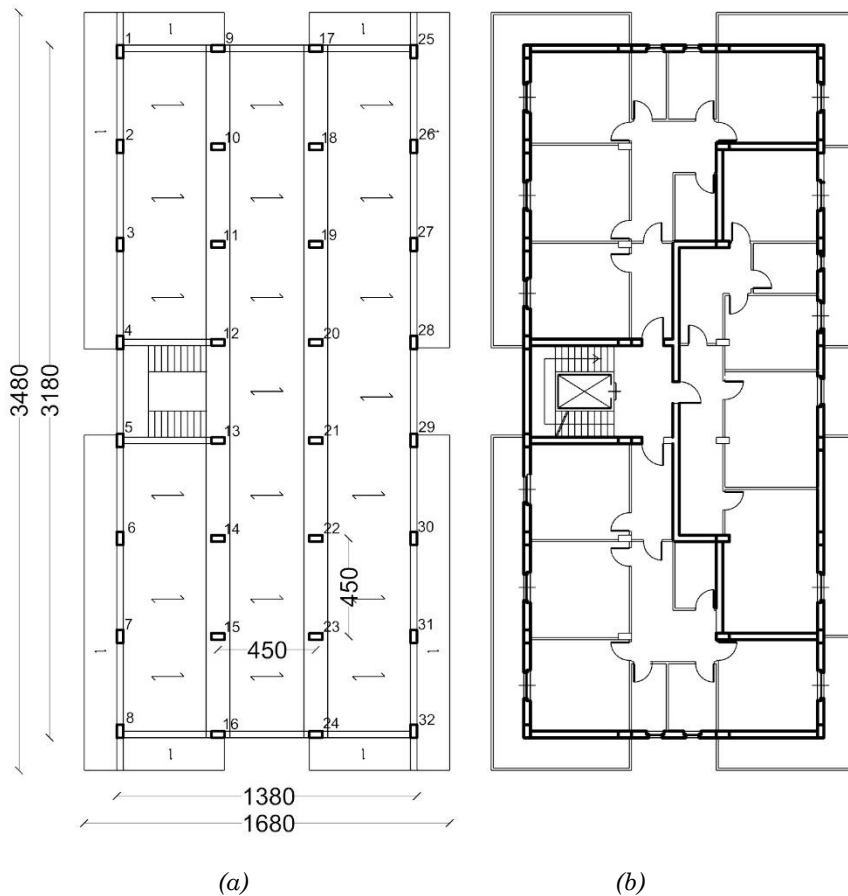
Generic architectural (a) and structural (b) plan of the case study.
